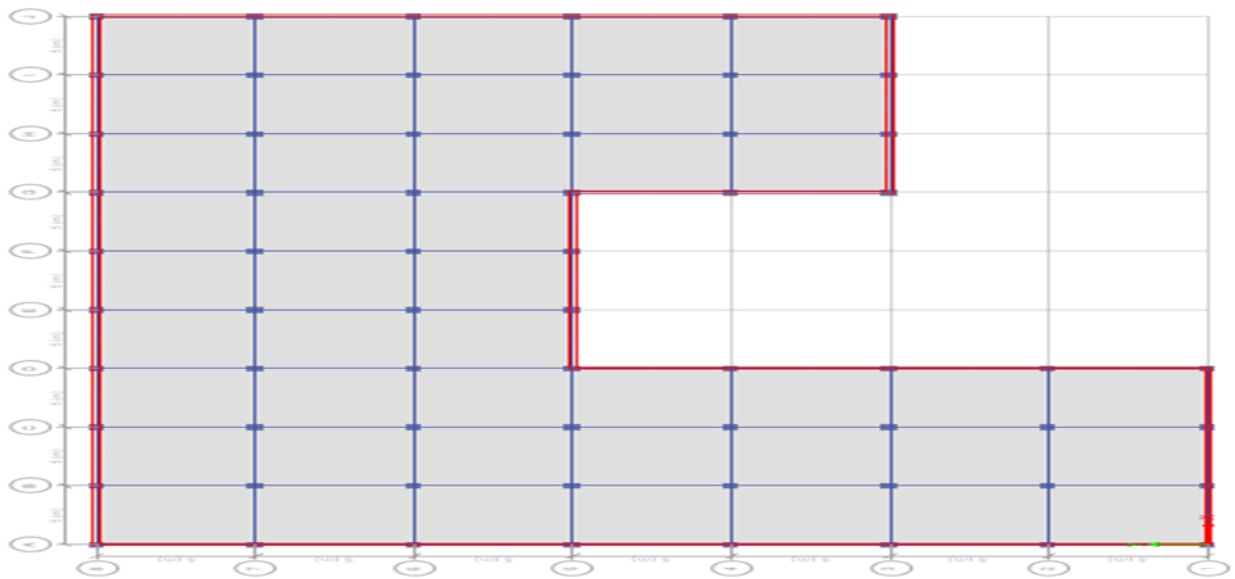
Plan view of and C- Unsymmetrical type with Shear wall at Alternate floor with blast loading
